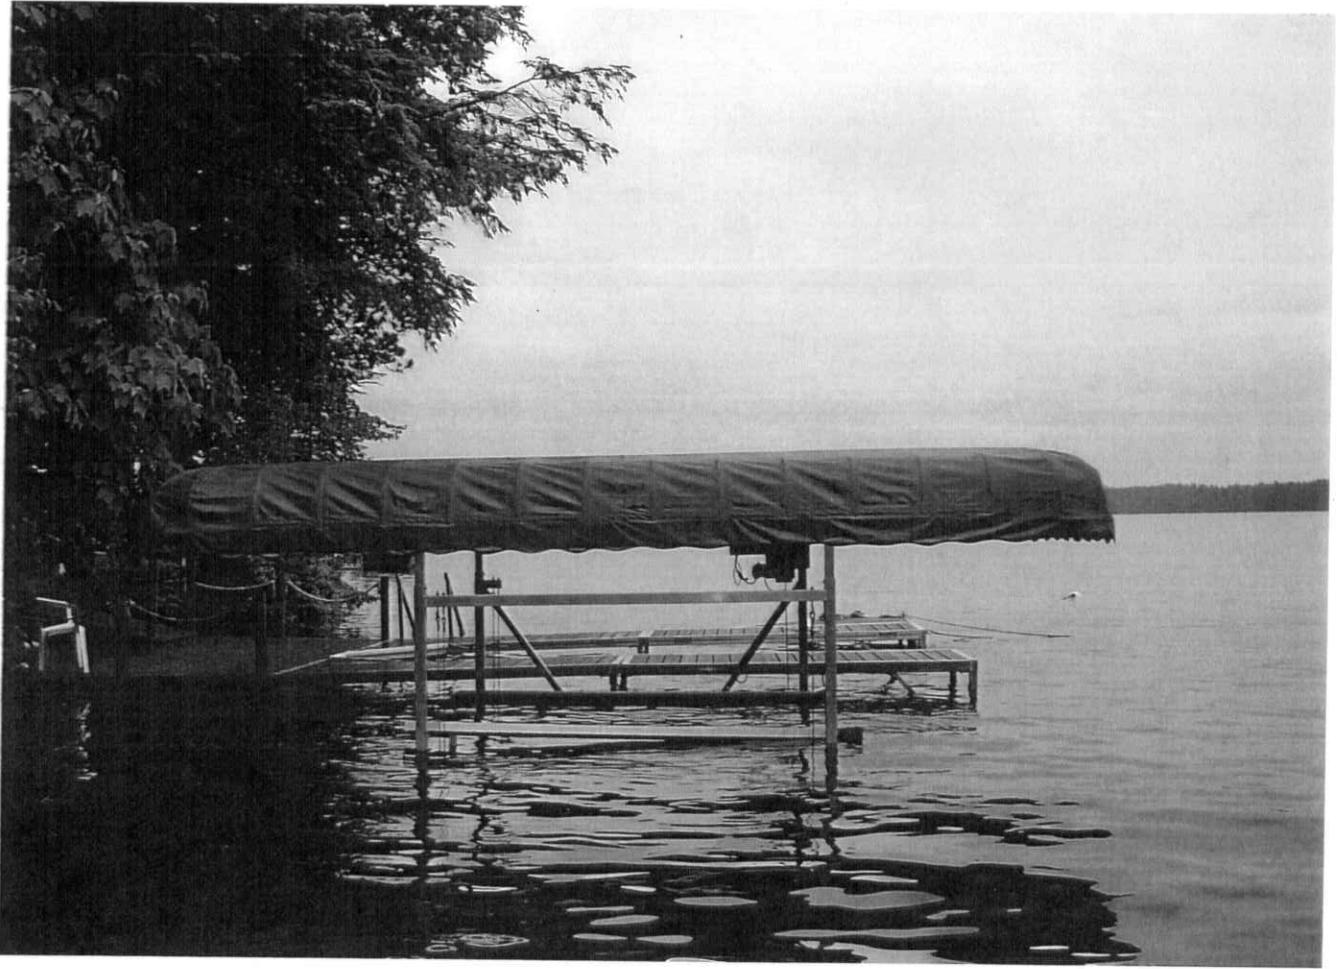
was taken from Great Pond facing South and shows right side view of the boat lift.
